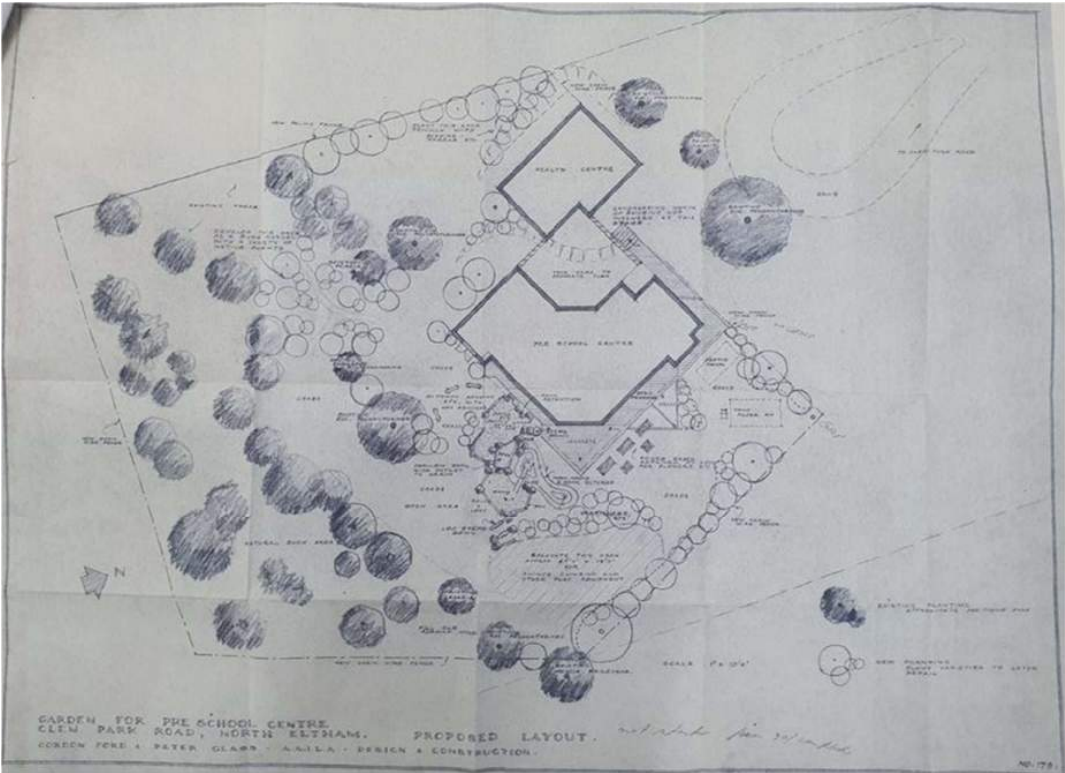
Plan for the proposed layout by landscape designer Gordon Ford and artist, conservationist and landscape architect Peter Glass for the garden at Eltham North Preschool and Infant Welfare Centre, c1973 (PROV c1973, Public Building File).
